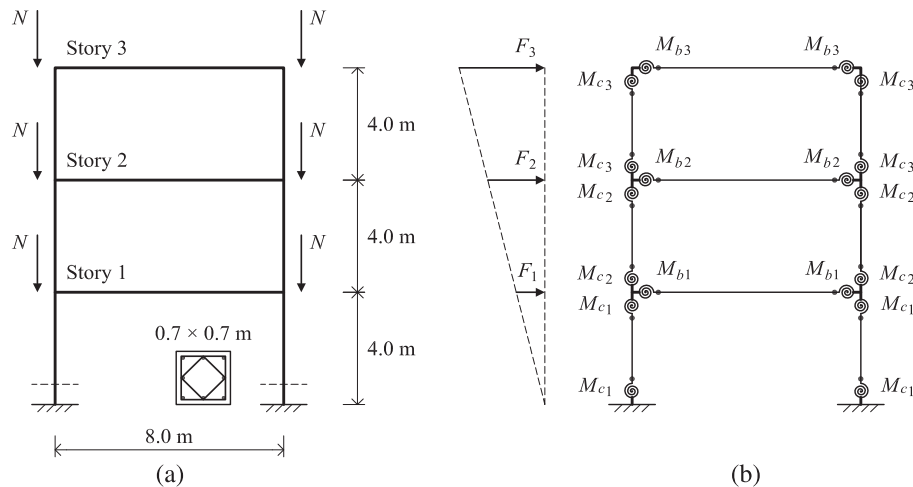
Three-story concrete-frame building. (a) Geometrical dimensions and column cross-section. (b) Structural modeling.
